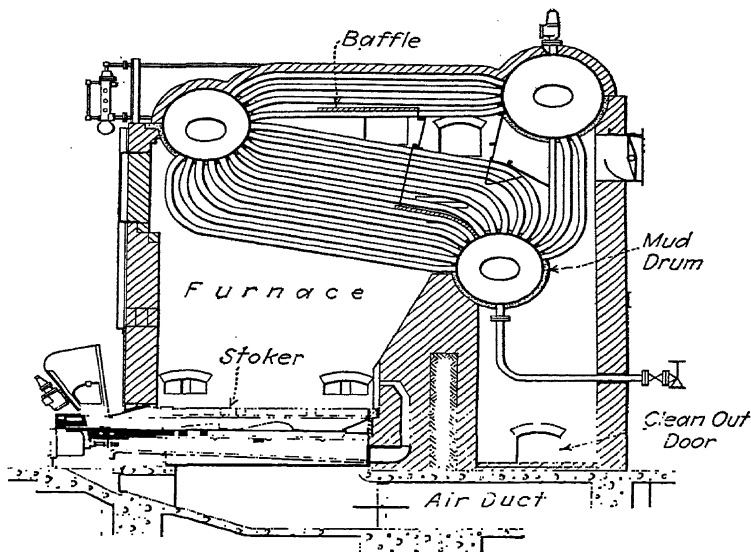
Furnace for single-retort, underfeed stoker and a low-head, bent-tube boiler.
